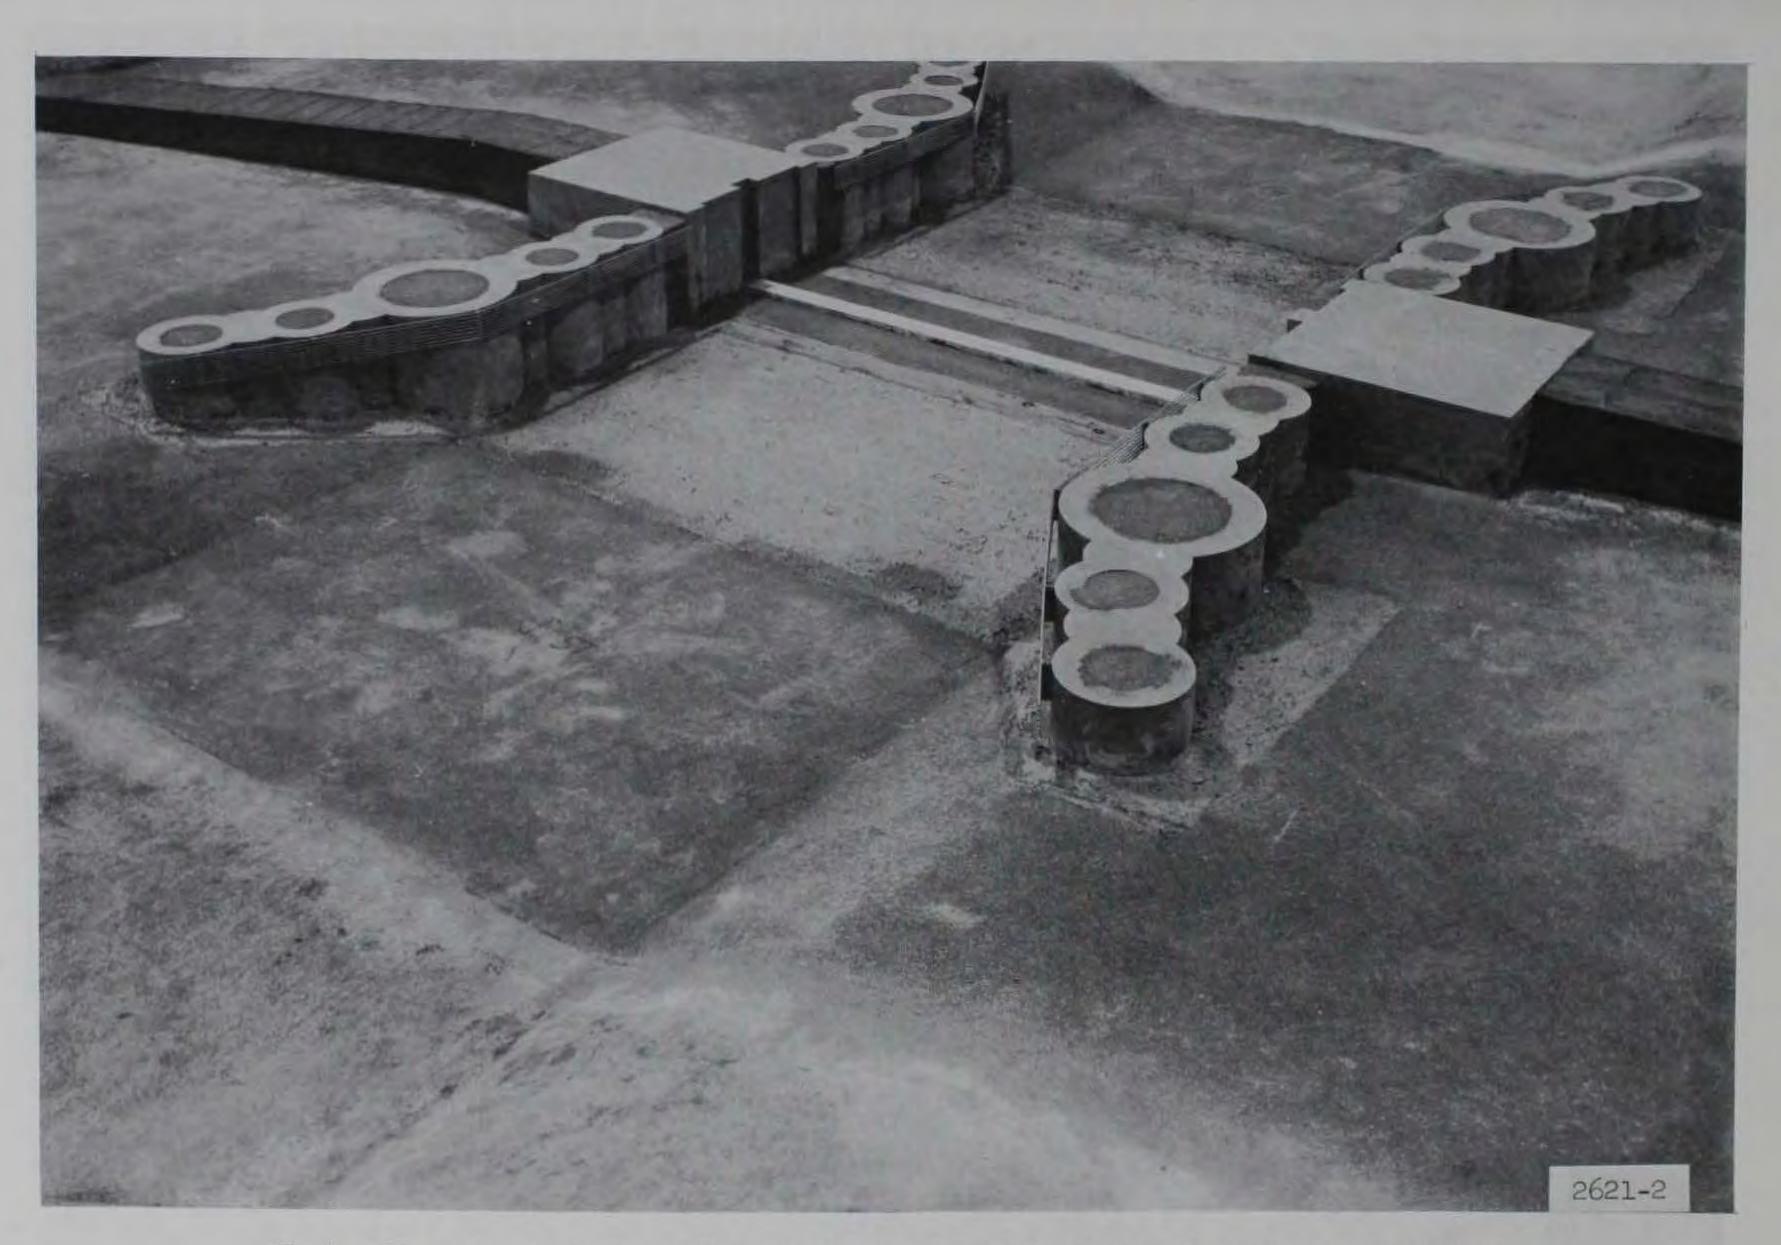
Gamma plan, undistorted-scale model of the navigation structure
